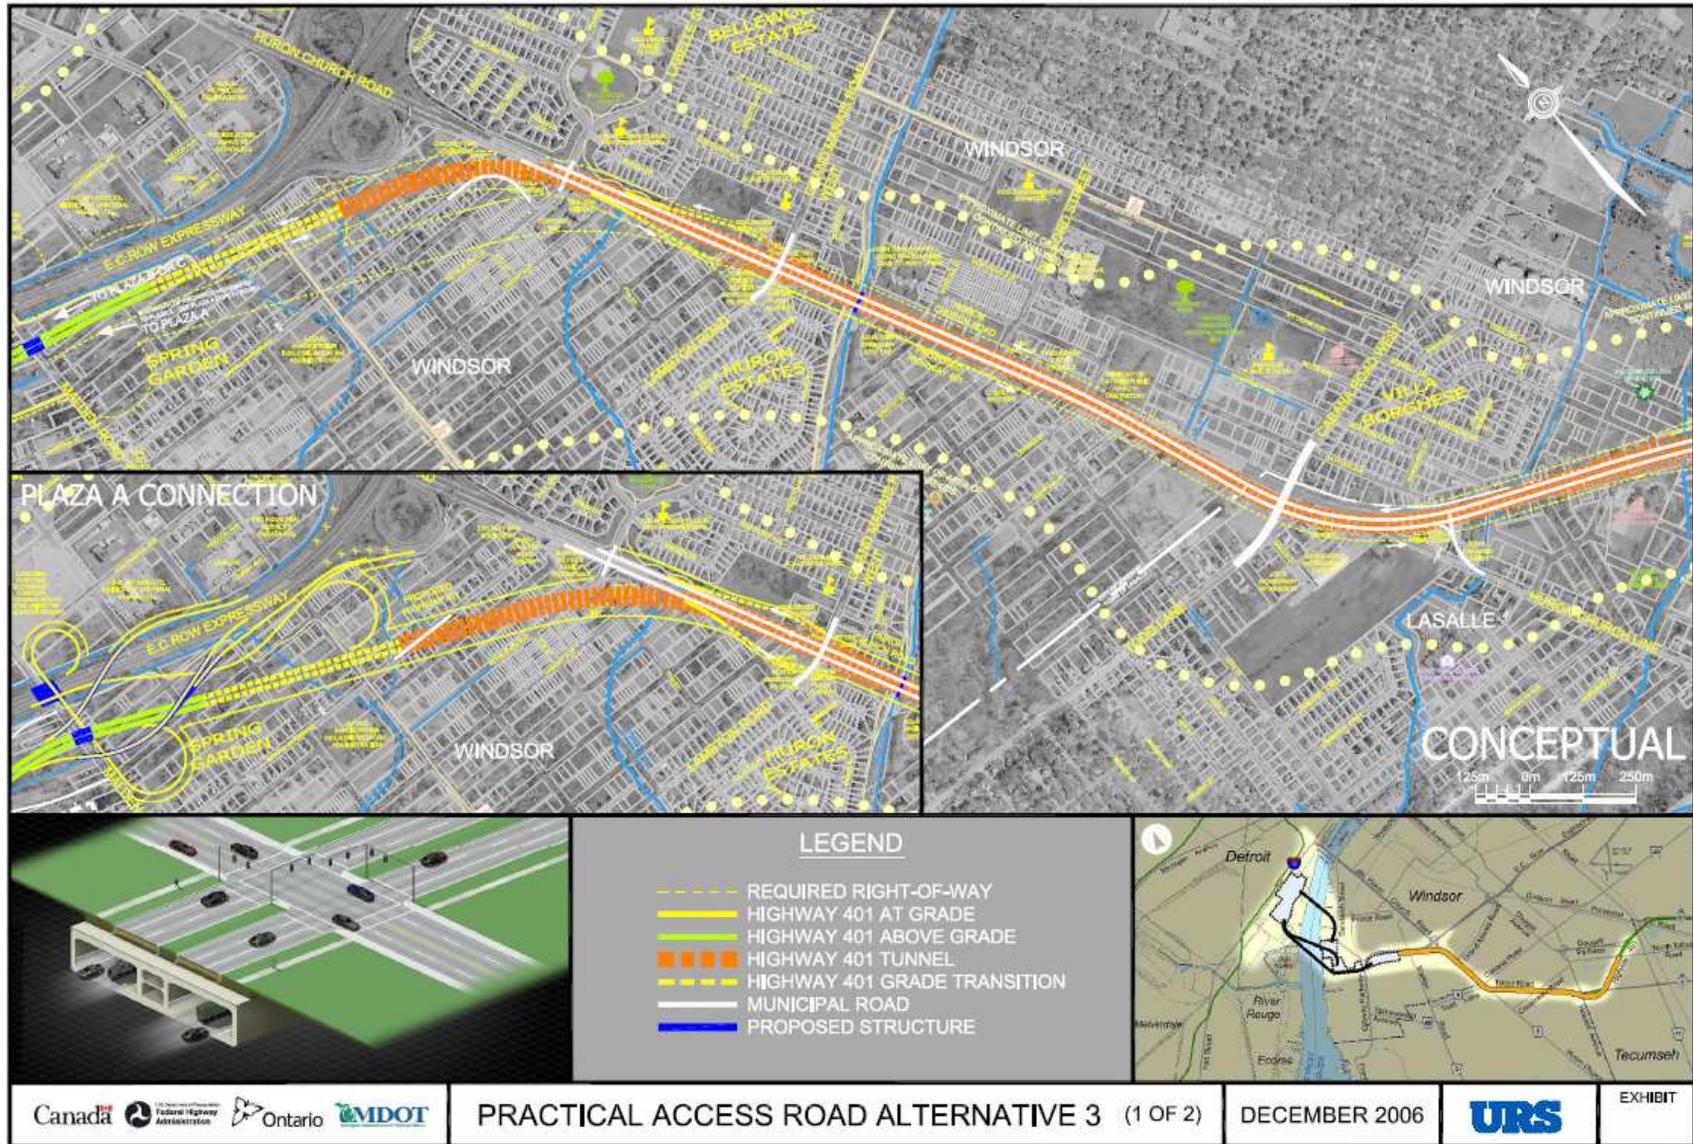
PRACTICAL ACCESS ROAD ALTERNATIVE 3
